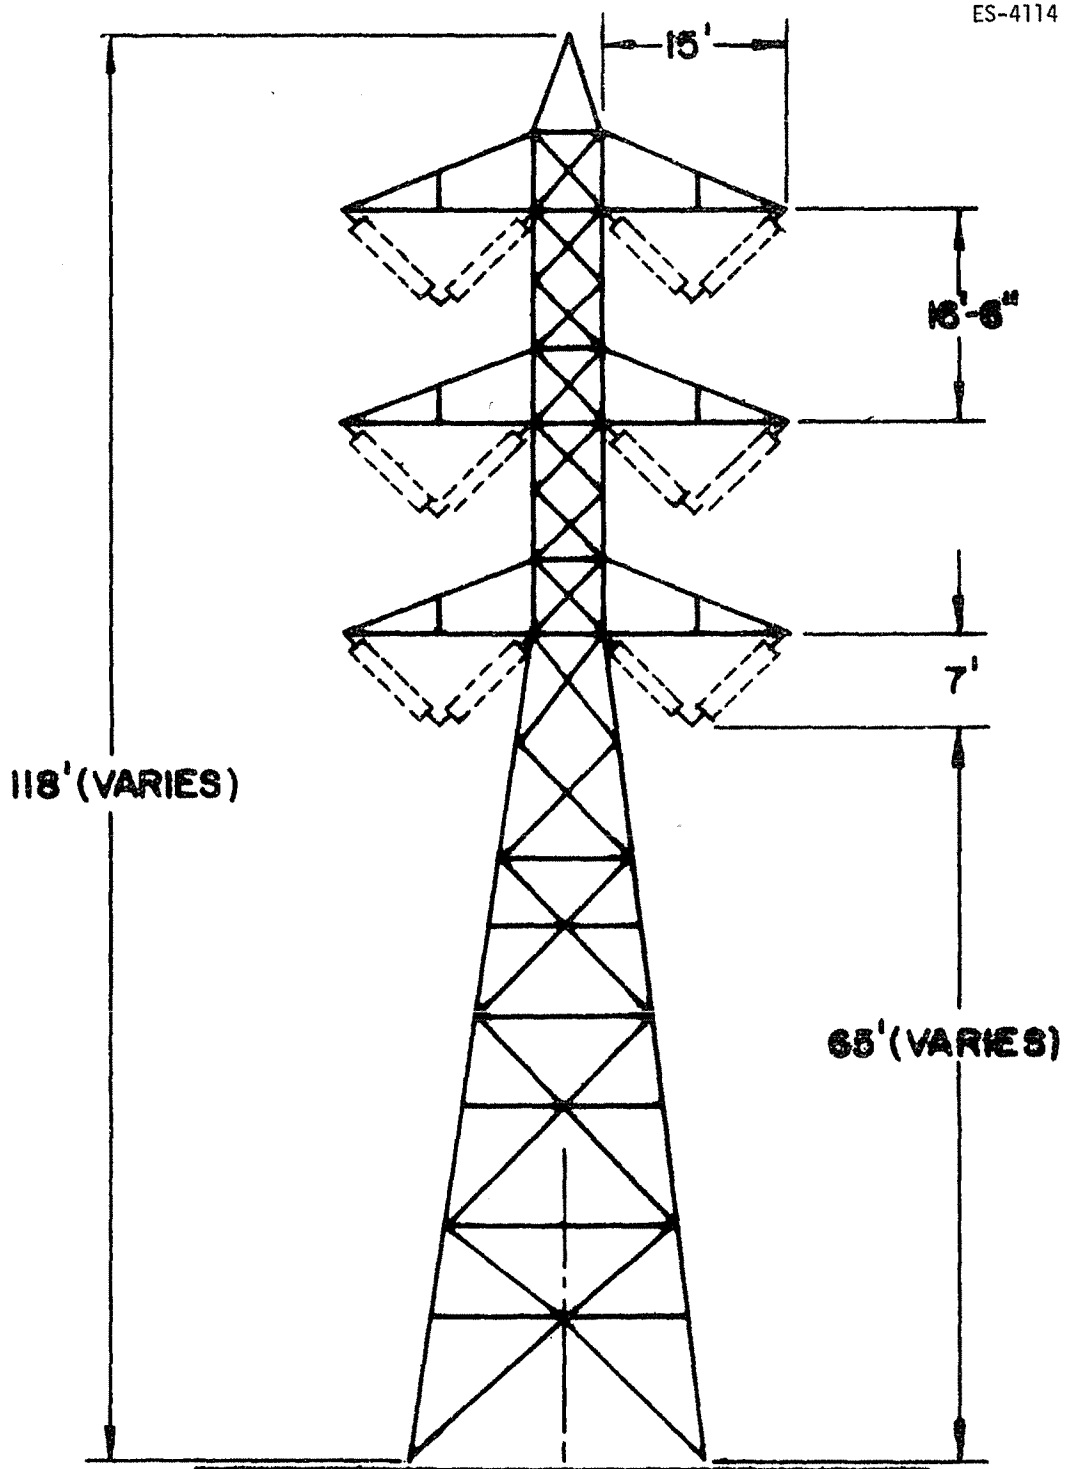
Typical steel lattice tower design used by San Diego Gas and Electric Company.
